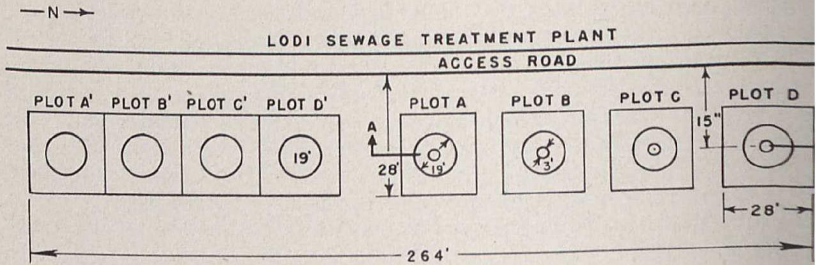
shows a plan of the test basins as well as the layout of the sampling points.
